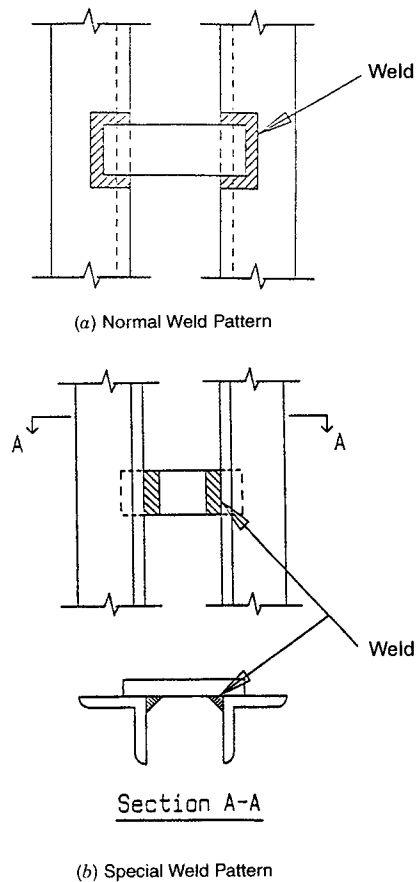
Welding of intermediate connectors between double angles.
